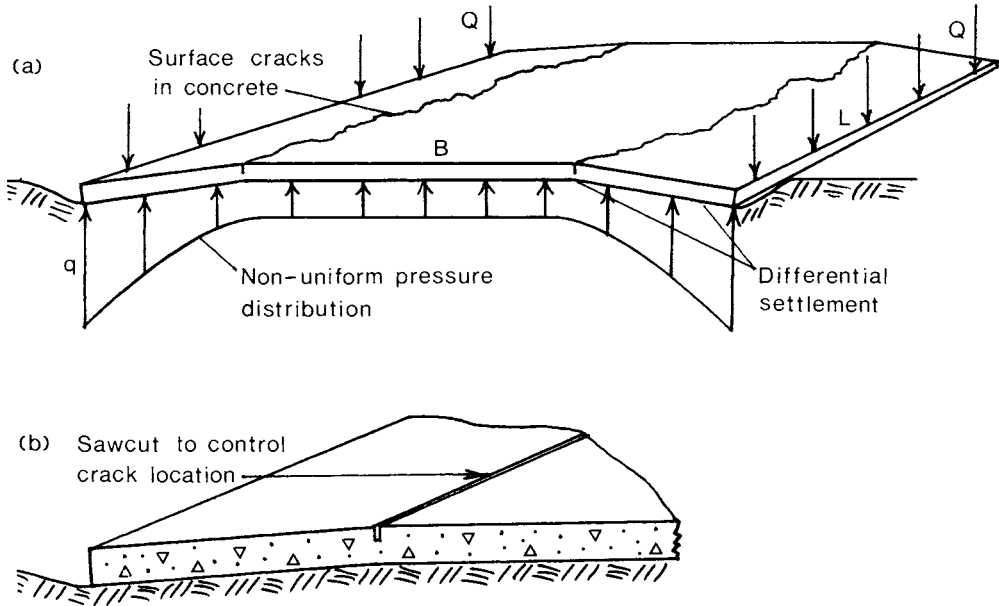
The control of surface cracking in a wide raft footing.
